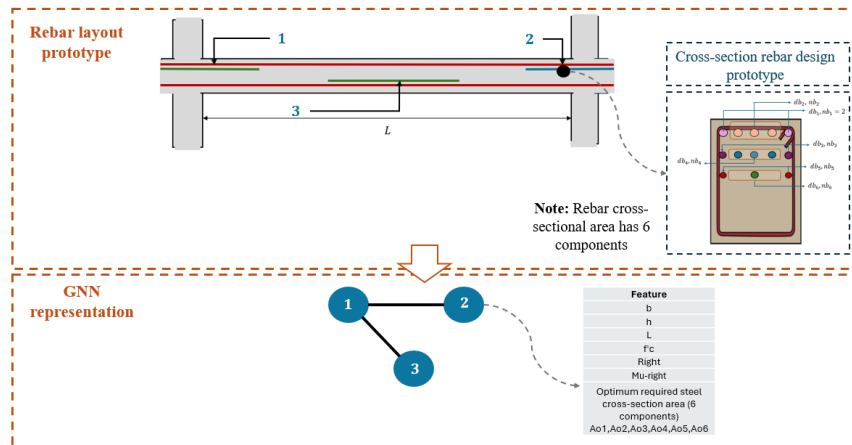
Architecture of the GNN for rebar representation in single-span concrete beams.
